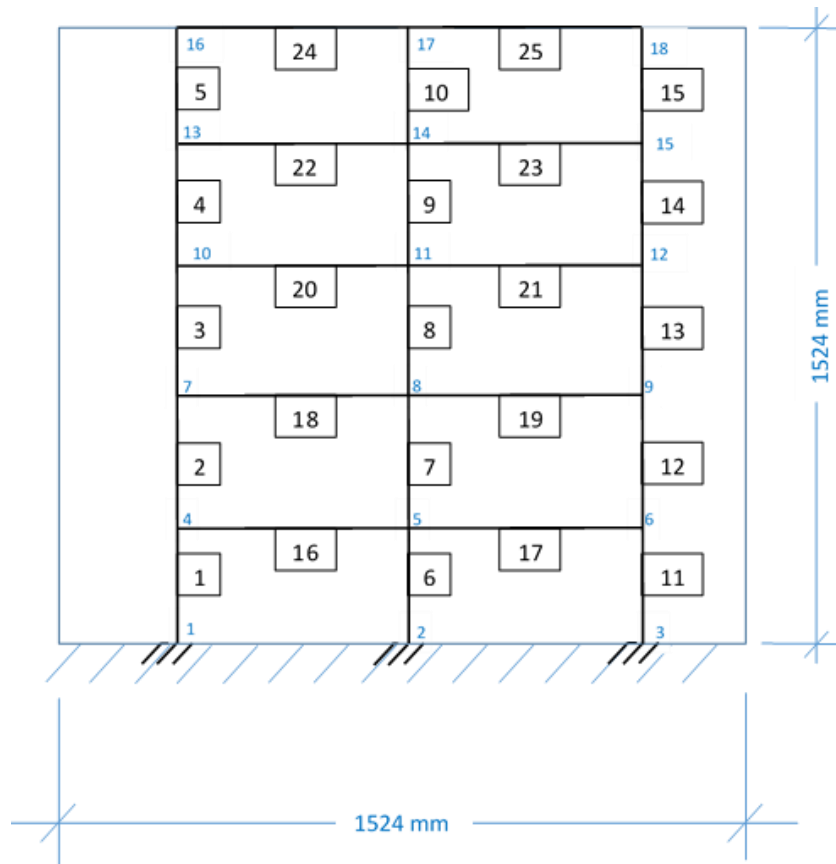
Schematic of the grillage model for wall SC1 with joints and elements labelling.
